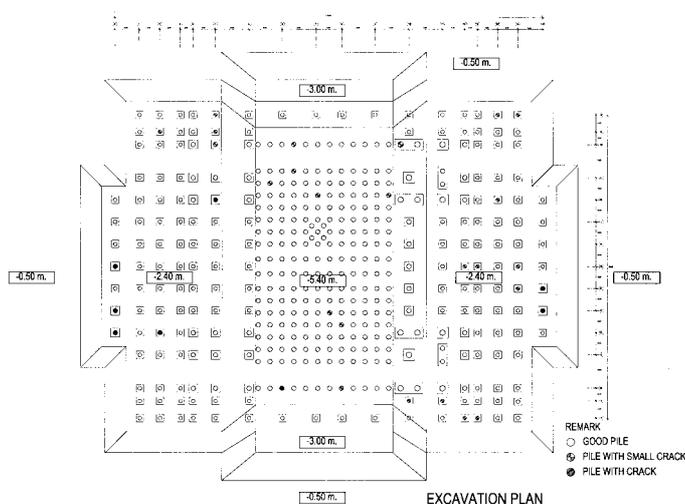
Excavation Plan and Location of Damaged Piles
